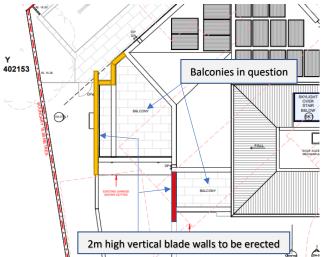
Closer view of the first-floor balconies in question and suggested privacy walls to maintain the amenity of 3 Sherwin St.
